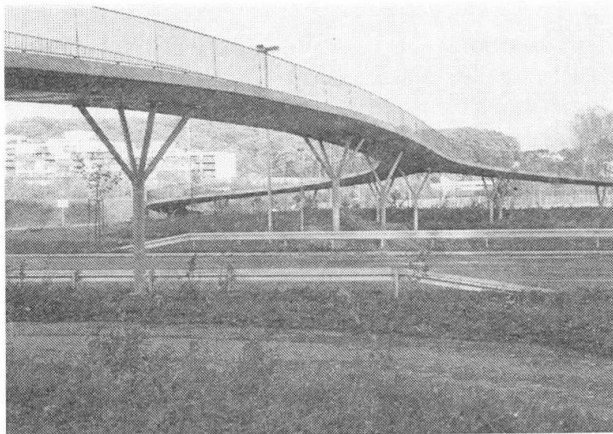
A pedestrian bridge, slender steel tubes supporting a concrete slab
